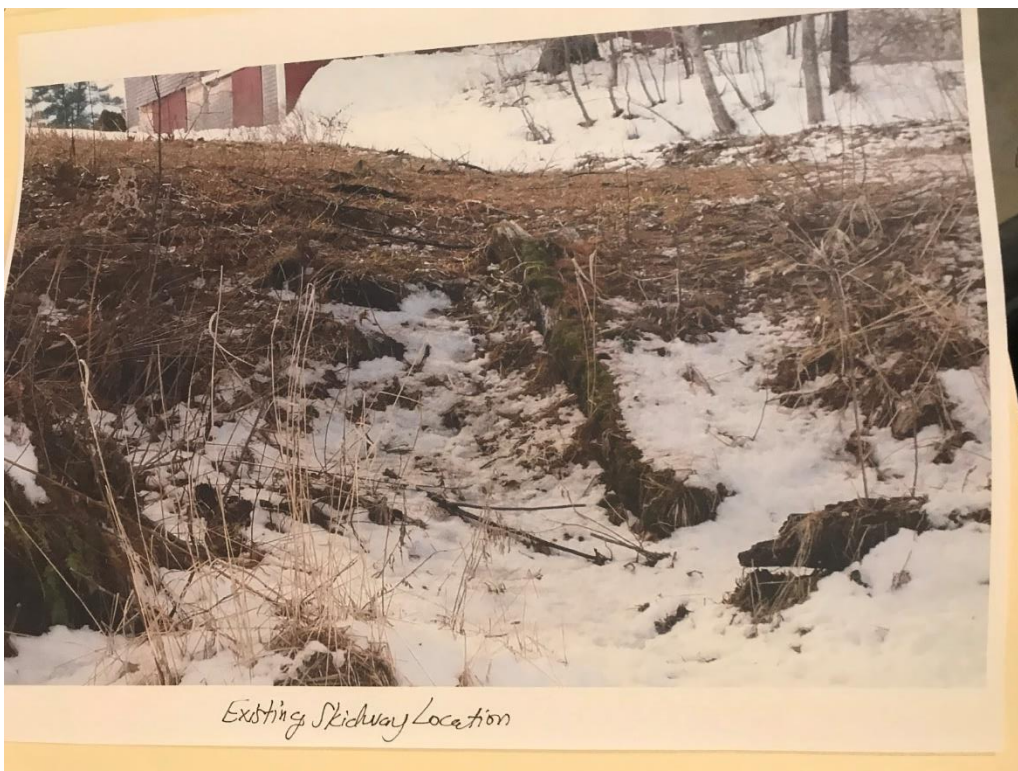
Barth/Conboy (commenter) - permanent haul out / launching structure; (approx location near house) a permanent structure (skidway) used for launching small boats (photo from file, no current photo handy) permitted by Alna planning board as a rehabilitation in or about 2007/2008
